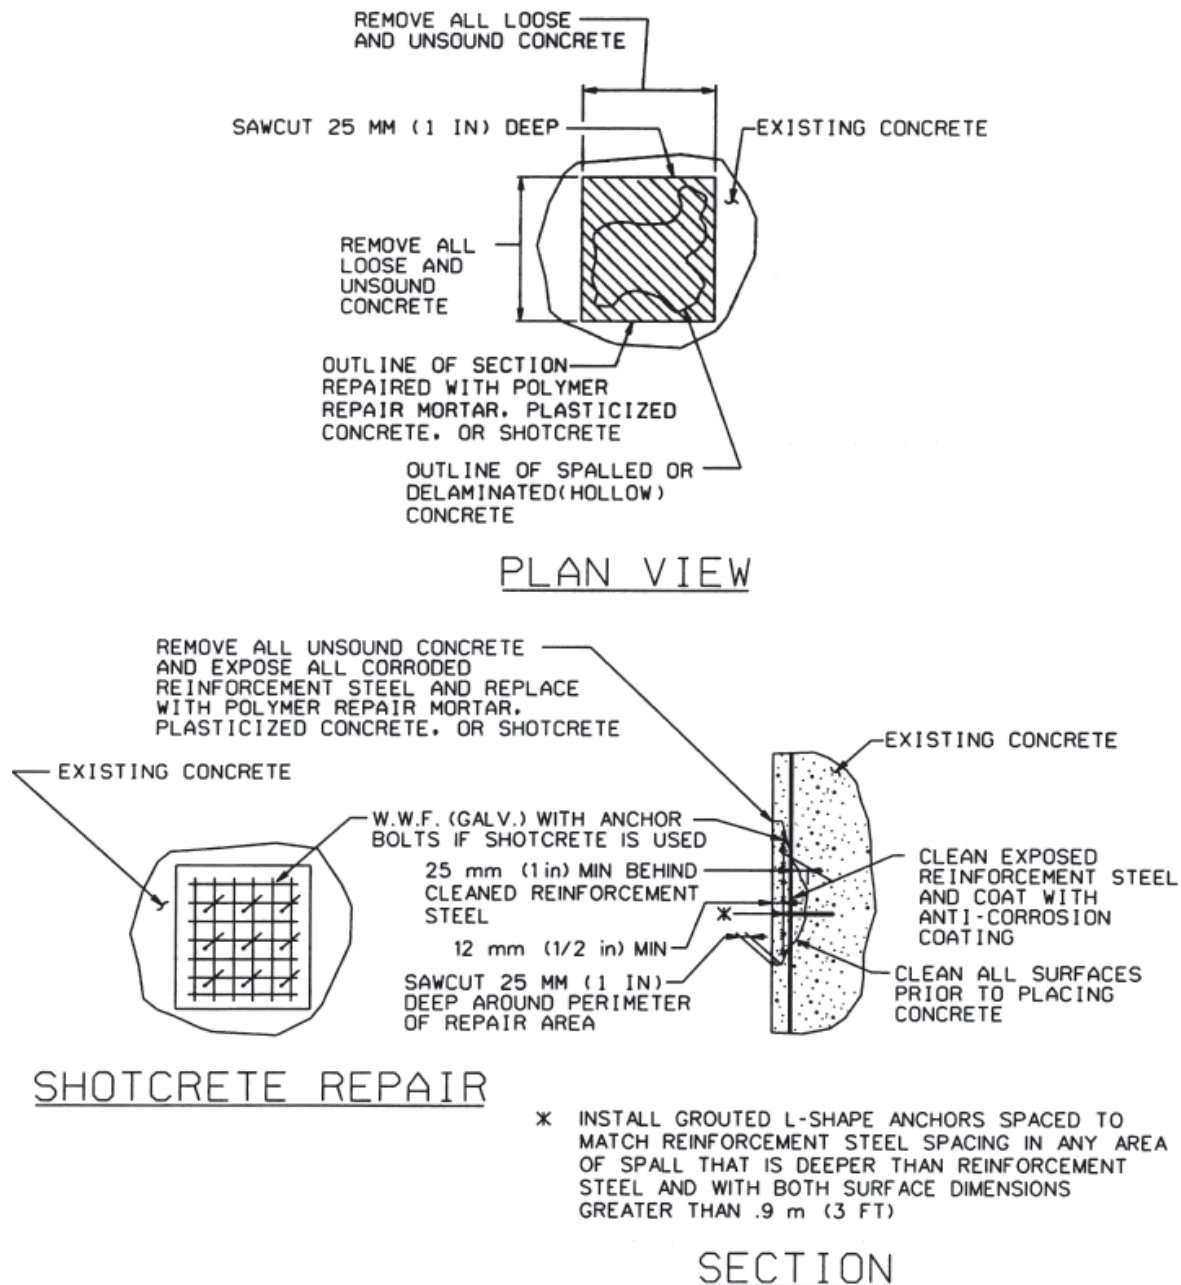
Typical Sections at Concrete Repair (FHWA, 2005b)
